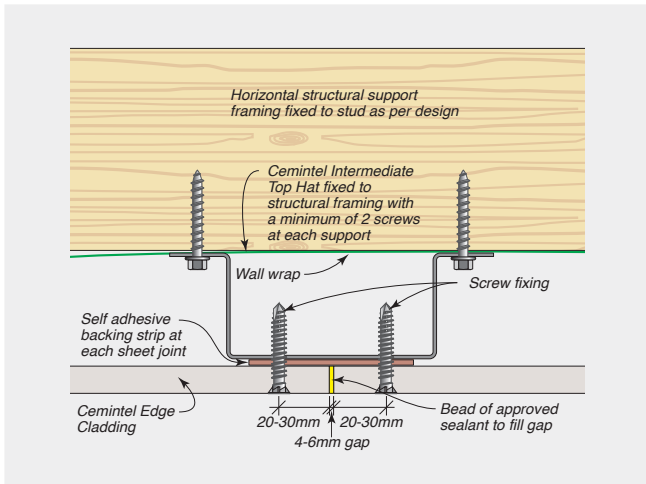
Typical Cavity Fix Cladding to Tophat – Horizontal Joint
